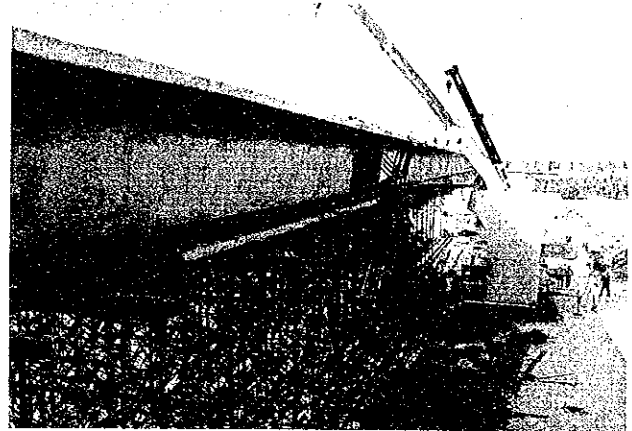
Mansula Bridge (cast-in-place PC)
